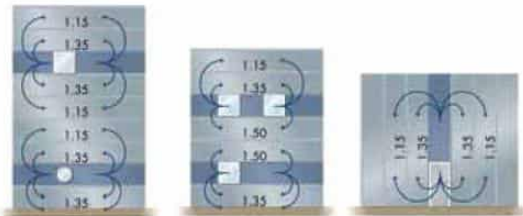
The wall woodwork holes in sandwich panels that do not require supplementary understructure.
